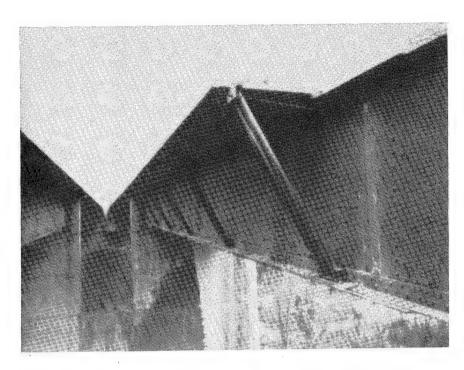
Brackets attached to girders provide temporary support, Kansas River Bridge (from Smyers 1984)
